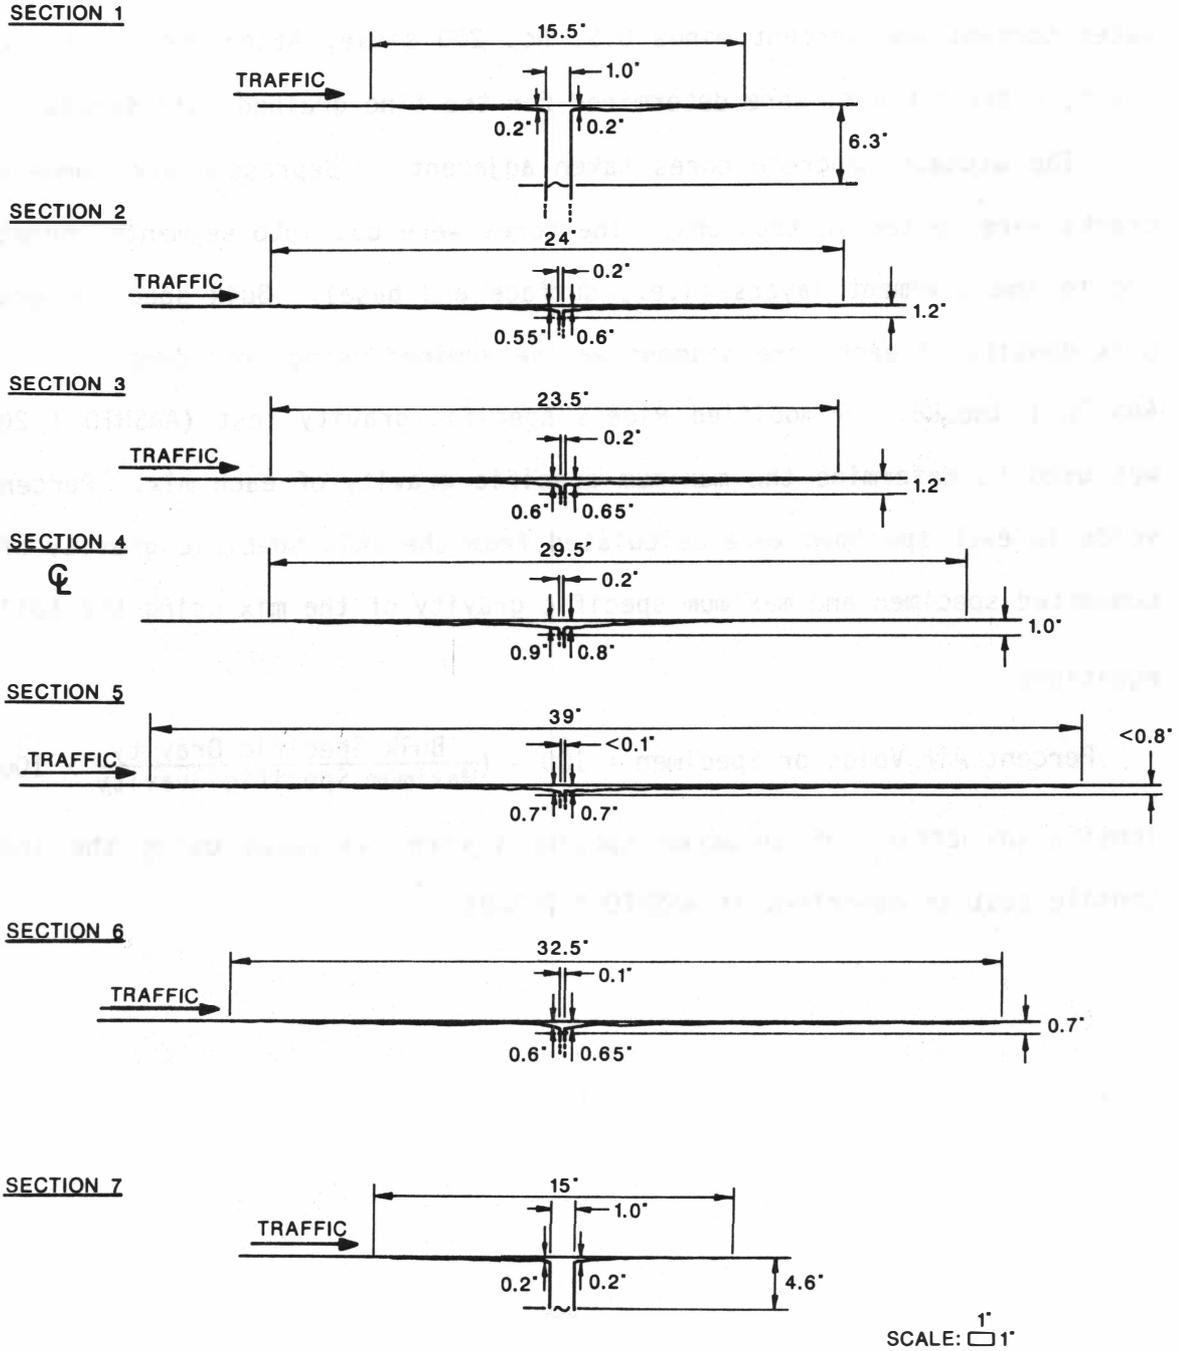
Typical Transverse Crack/Depression Cross Sections for a Selected Transverse Crack
